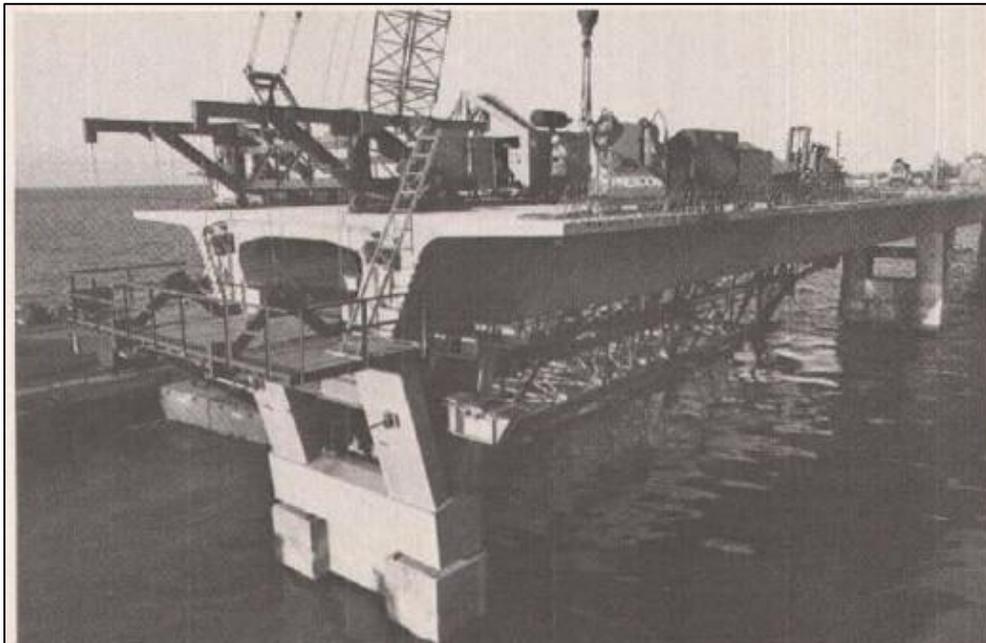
Photograph of the construction of the Long Key bridge showing the support truss and a section of the box girder being placed on a V-pier, 1978-1981.
